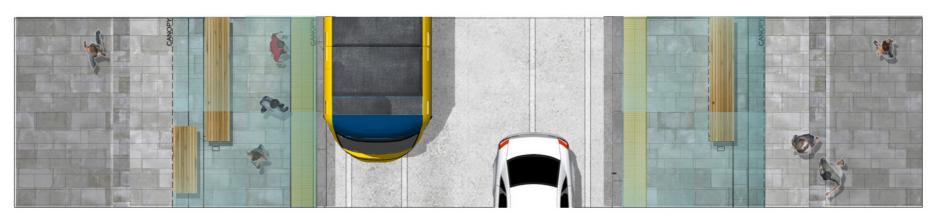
Partial plan and cross section of Dominion Road. Shared carriageway with side platform shared with footpath. Intersections signalised to allow alternating LRV and vehicle traffic
